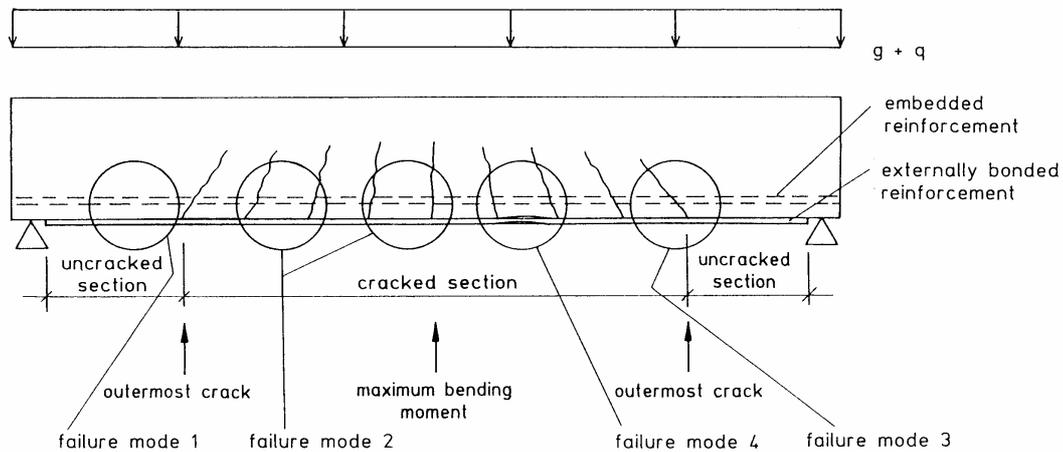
Bond failure modes of a concrete member with EBR (Blaschko et al. 1998).
